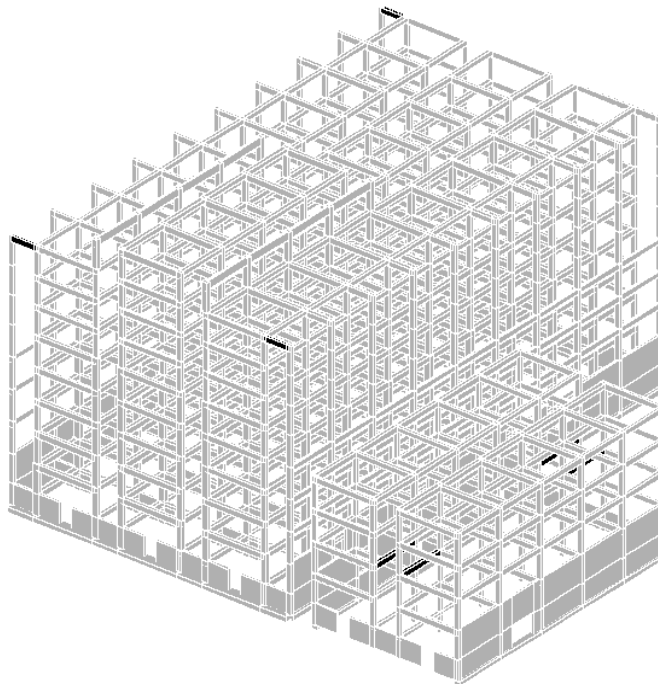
A healthcare structure showing potential beam shear failures at the recommended load level.
